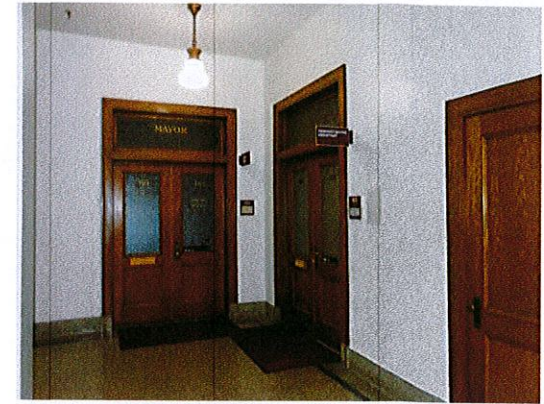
Typical corridor doors are narrow double doors (a single leaf provides a 27" clear opening vs. 32" min) with knob style hardware.
